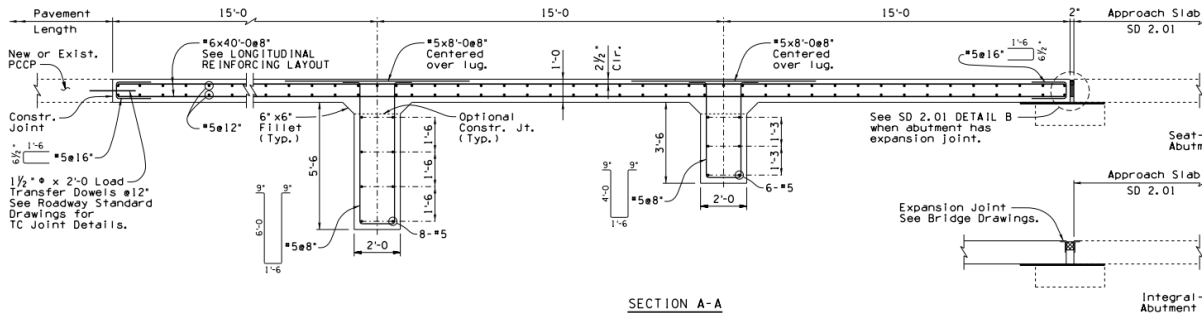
Arizona DOT Pavement Lug (Arizona DOT Standard Drawings)
